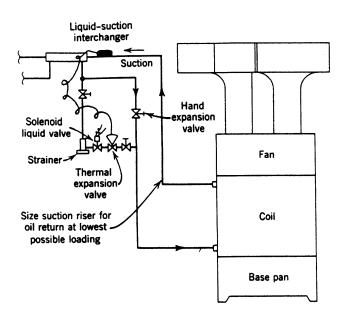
Forced circulation air cooler with directexpansion feed of flooded-type coil. (Courtesy of Carrier Corporation.)
